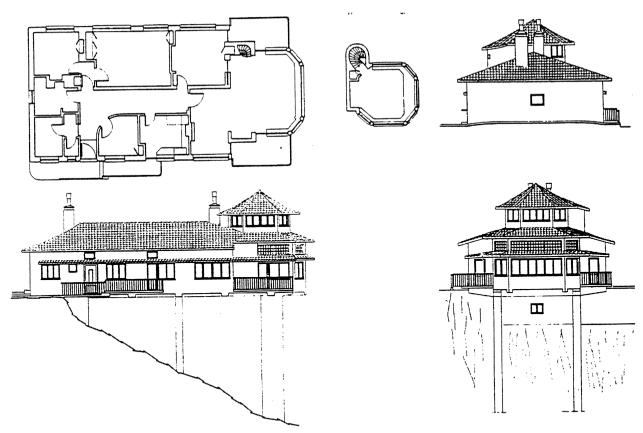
Bruno Taut, Own house in Istanbul, 1938, plans and elevations
